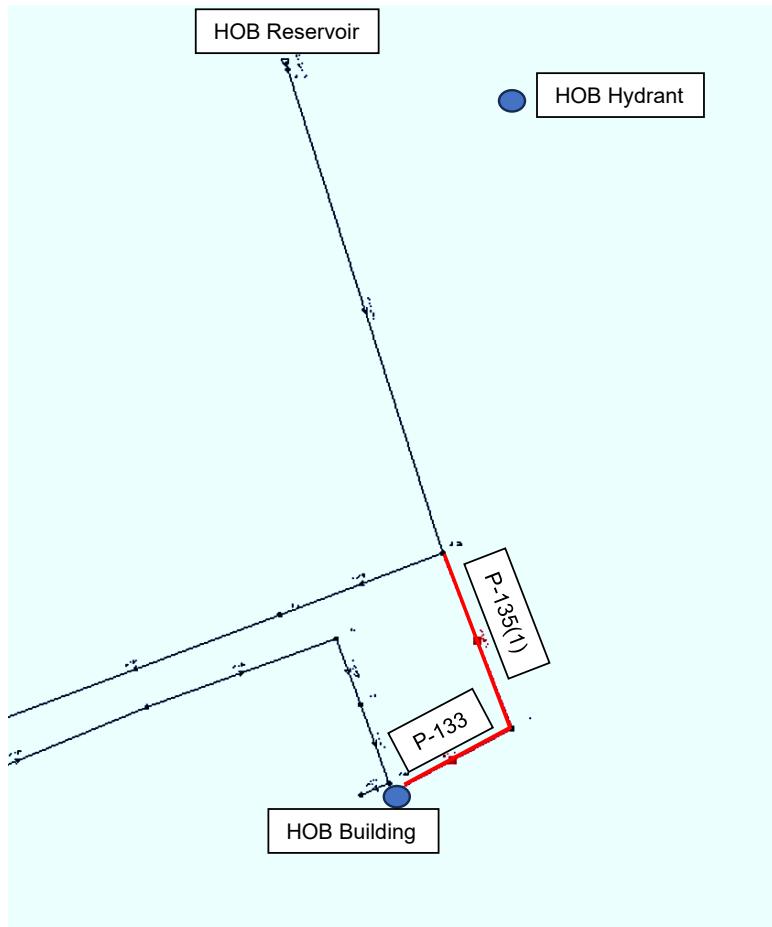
Proposed pipeline replacement of existing 6-in ACP supplying HOB.
